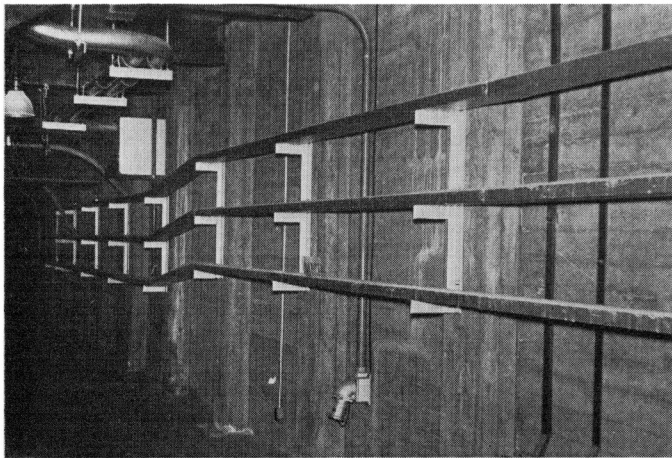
Cables laid in structural steel channels, supported by building columns, Avon Steam Plant, East Bay Division
